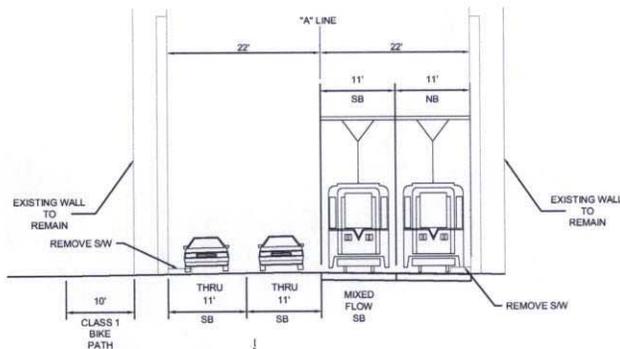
7th Street Between F Street and UPRR Crossing (looking north)
